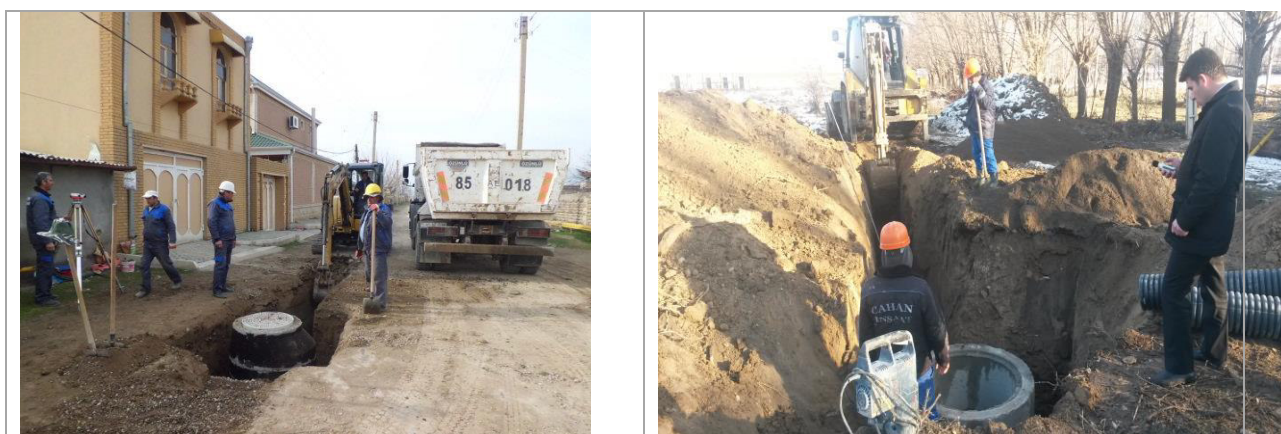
Noise and Dust Measurement Equipment at Pipeline construction on site
